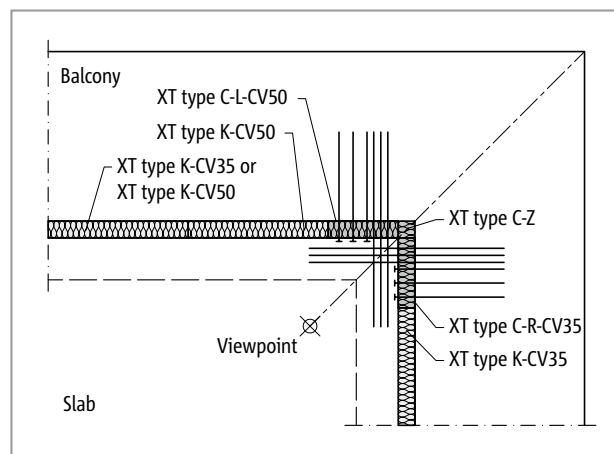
Schöck Isokorb® XT type C: Balcony with outer corner freely cantilevered (application XT type C-L-CV50, XT type C-R-CV35)
